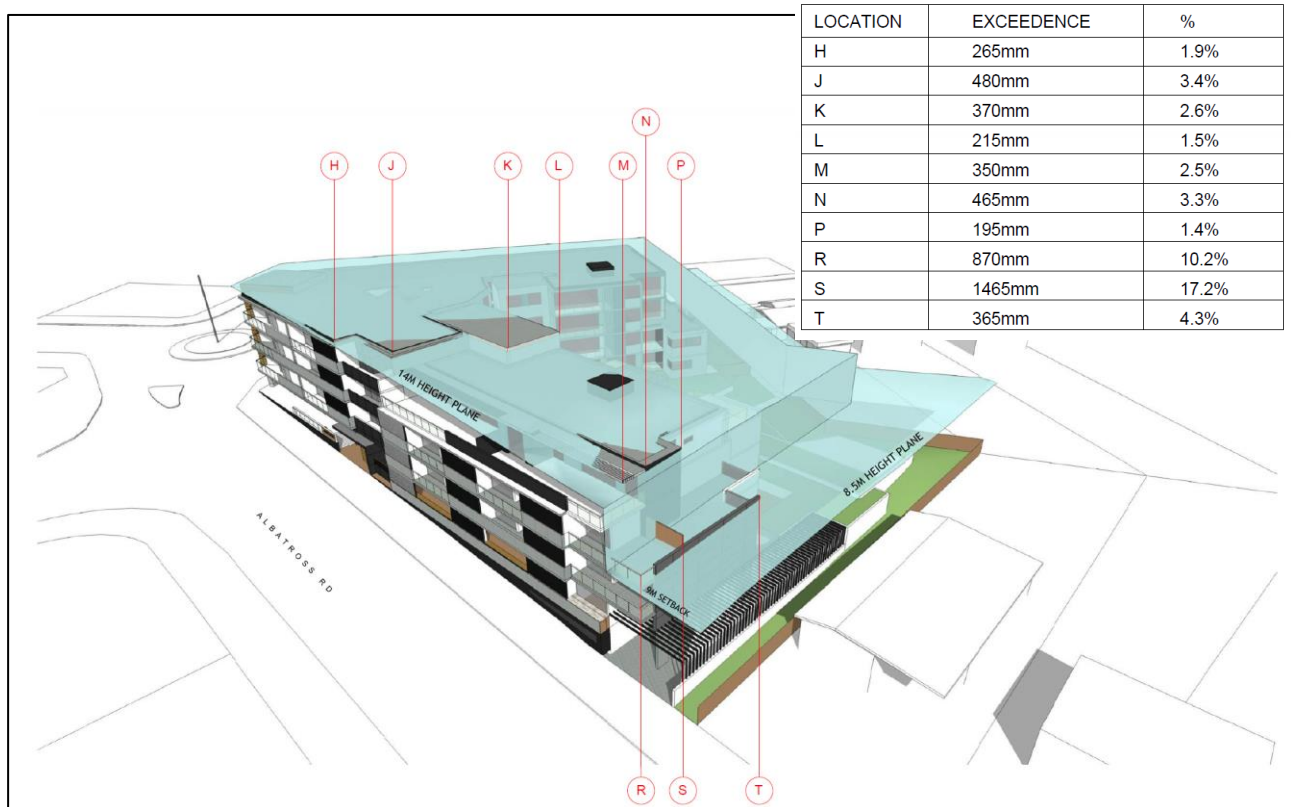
Height Plane instructions relating to the 14.0m (N2) and 8.5m (I2) maximum building height - southwestern view from Albatross Street.
